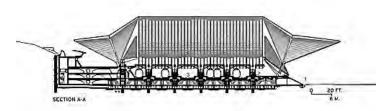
Liege-Guillemins TGV Railway Station Section. http://archrecord.construction.com/projects/bts/archives/transportat ion/10_TGV_Railway_Station/default.asp?bts=TR
